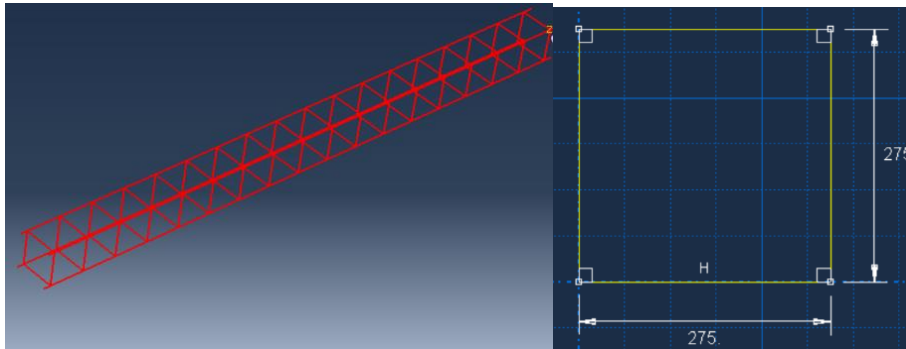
Longitudinal reinforcement and Stirrup bars parametrization
